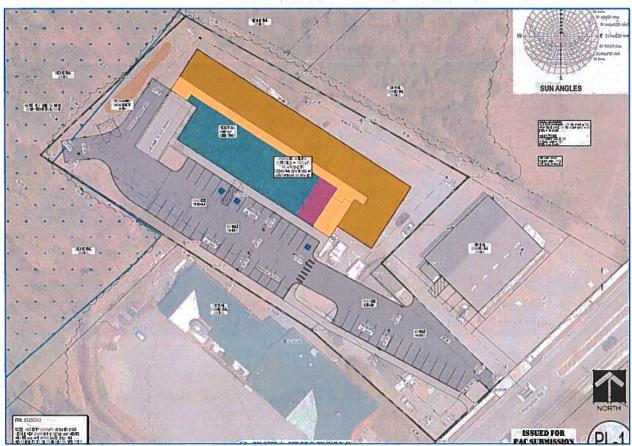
Site of 145-147 Hampton Road Proposed Apartment Building
